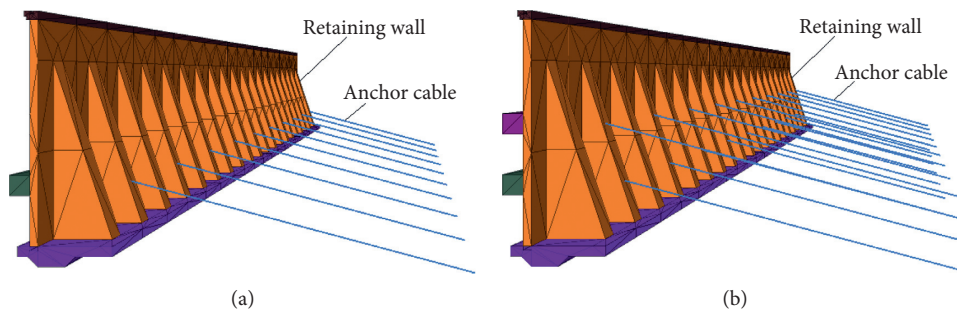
Anchor cable + waist beam control measure. (a) A row of anchor cables. (b) Two rows of anchor cables.
